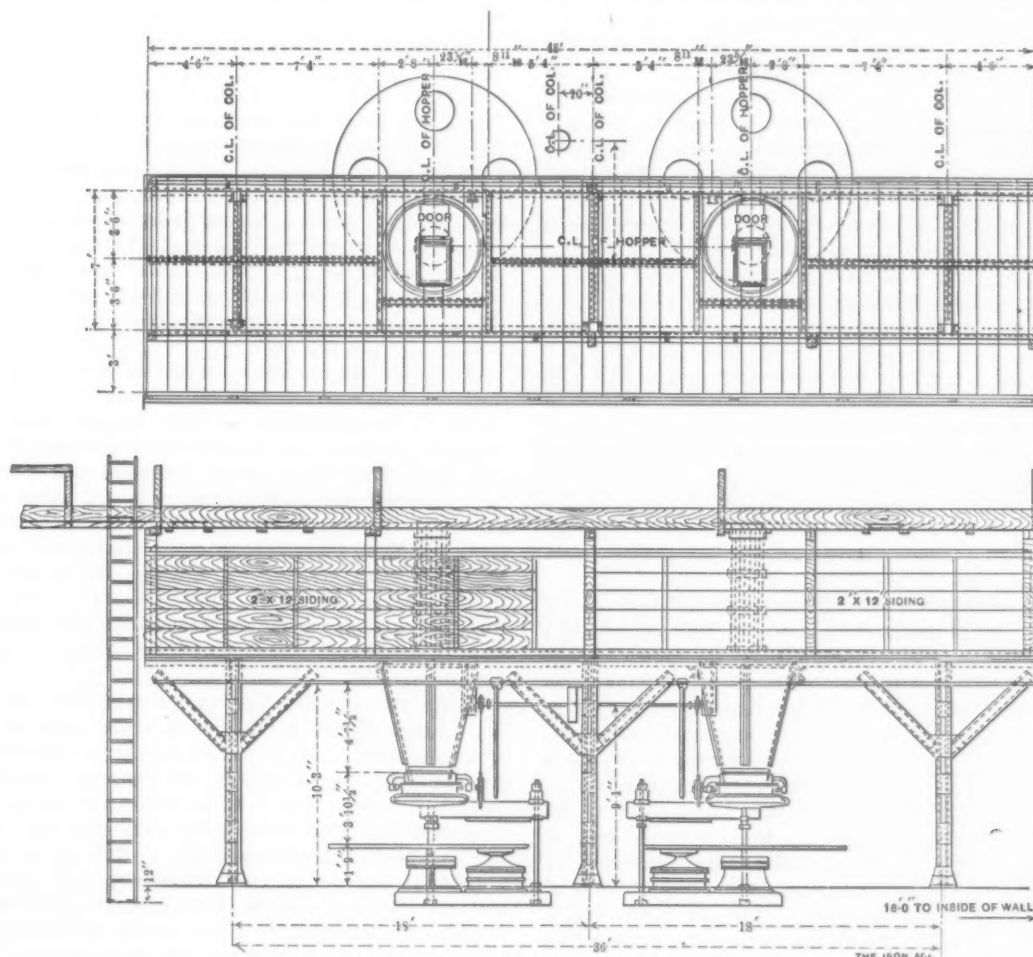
Plan and Side Elevation of Storage Platform and Feeders.
